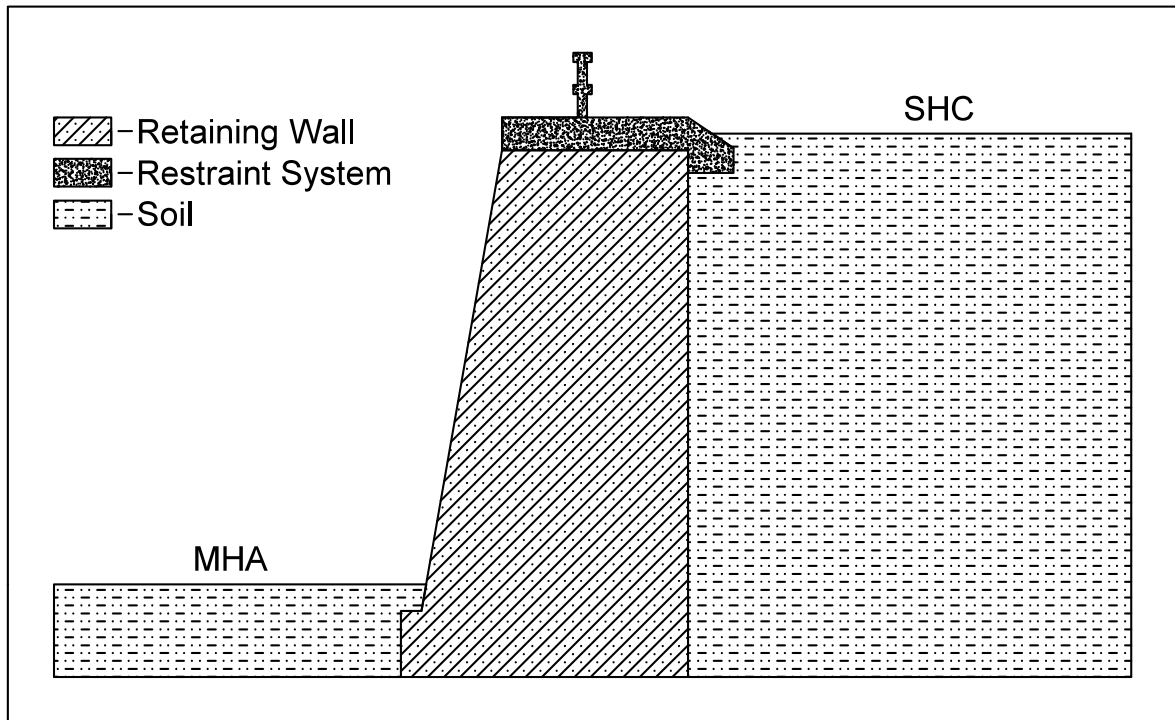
Cross-section of a typical retaining wall supporting the SRN
